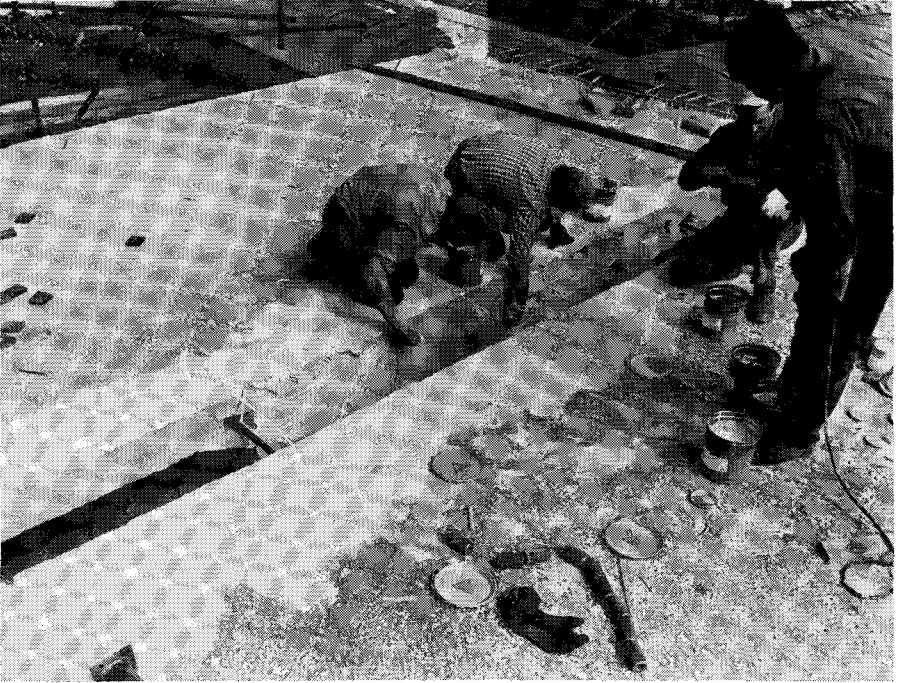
Manual application of epoxy adhesive on precast concrete segment.
